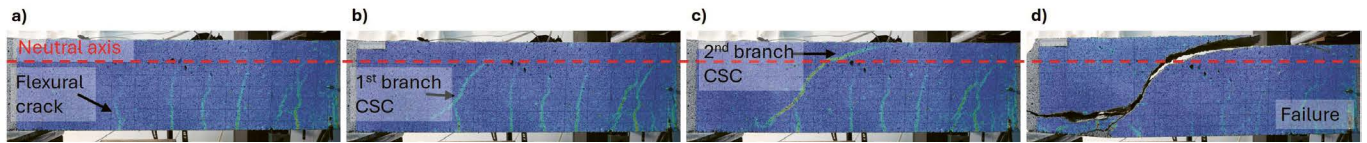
Crack pattern evolution in a RC beam, without stirrups, failing on shear.
